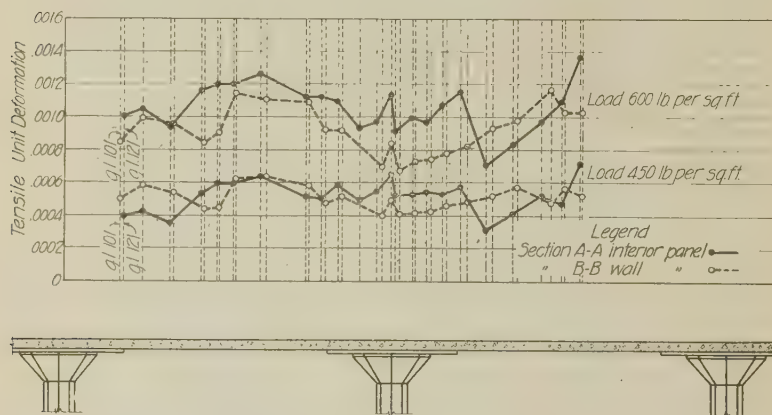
STRAIN DISTRIBUTION FOR REINFORCEMENT IN WALL PANEL AND INTERIOR PANEL OF SLAB J.
